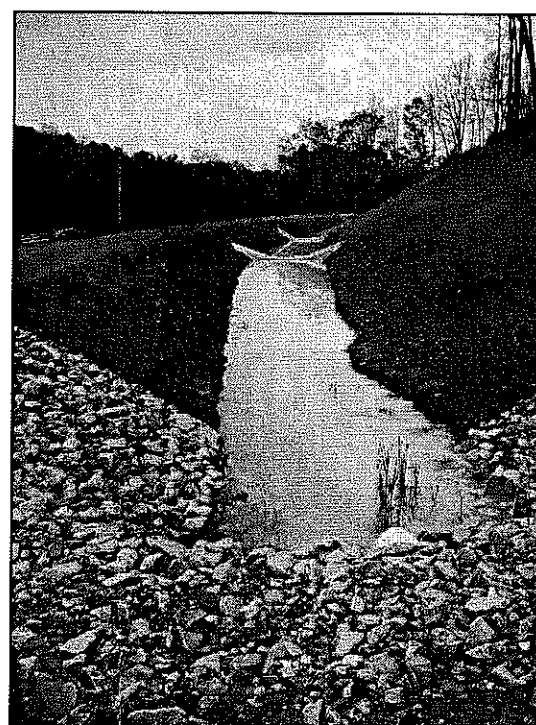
DOWNSTREAM VIEW OF SETTLING POND, BAFFLES, AND OUTLET PIPE FROM THE LIMESTONE POND
